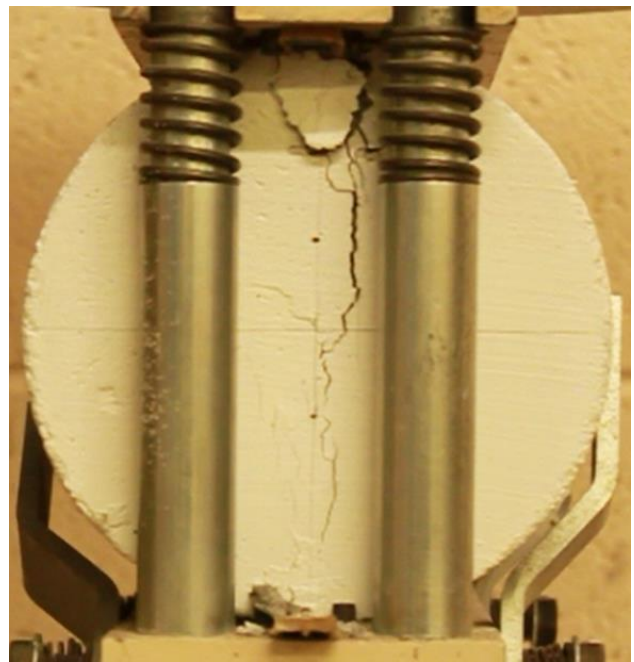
Steel fibres bridging the crack on a steel fibre cylinder set
